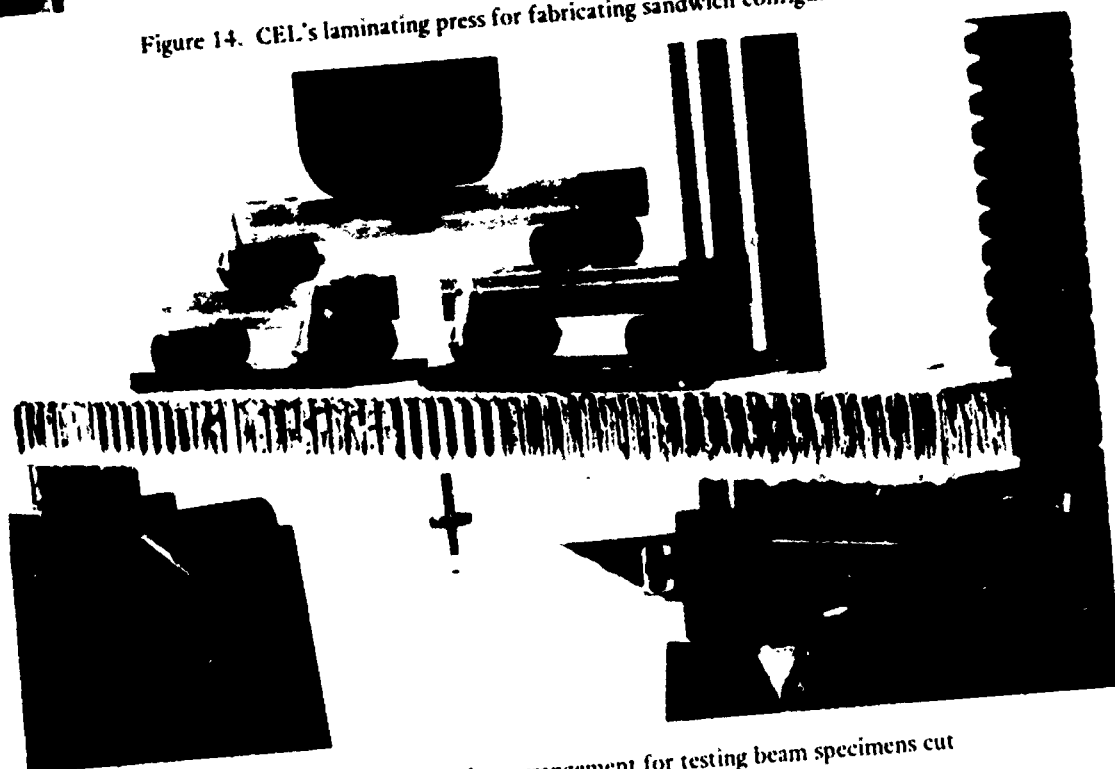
Four-point loading arrangement for testing beam specimens cut from sandwich configurations.
